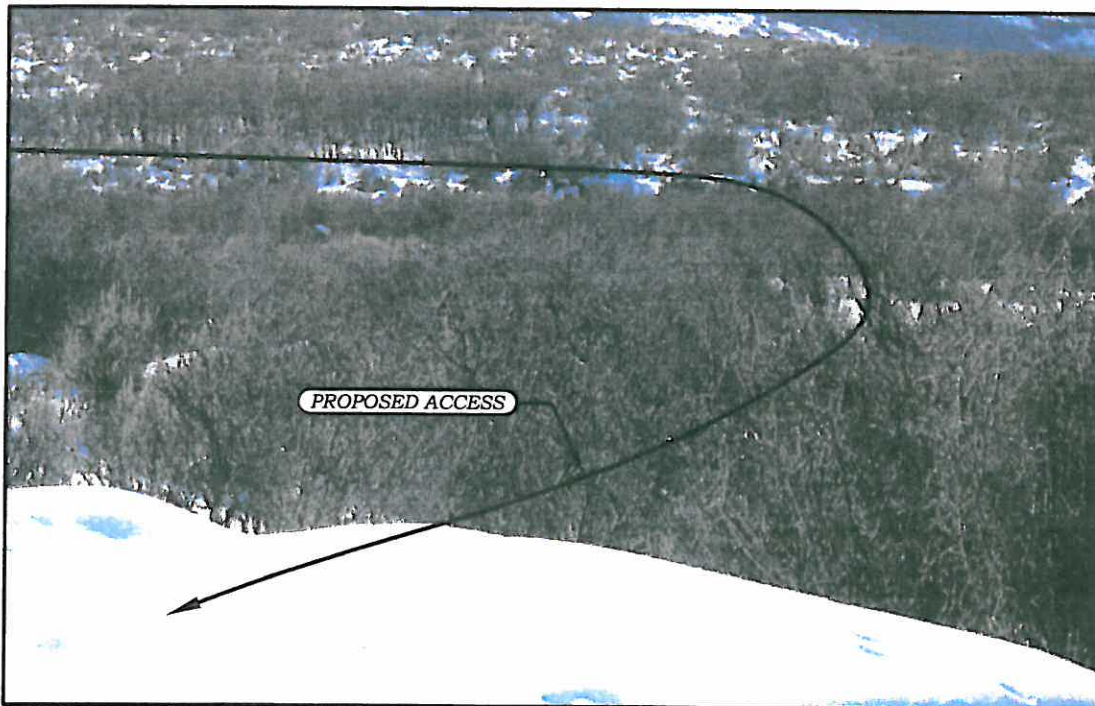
PHOTO: VIEW OF PROPOSED ACCESS ROAD
